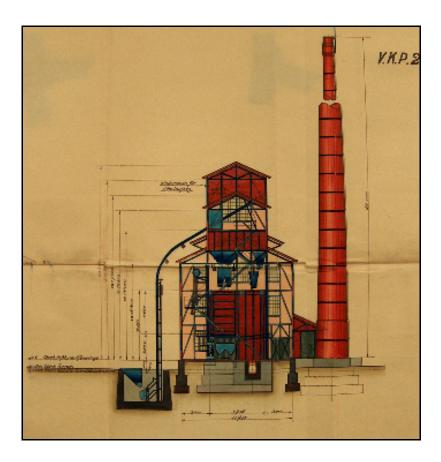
Detail from Ankara Gas Factory plan and section drawings Source: TRPARA 230/5.17.1
